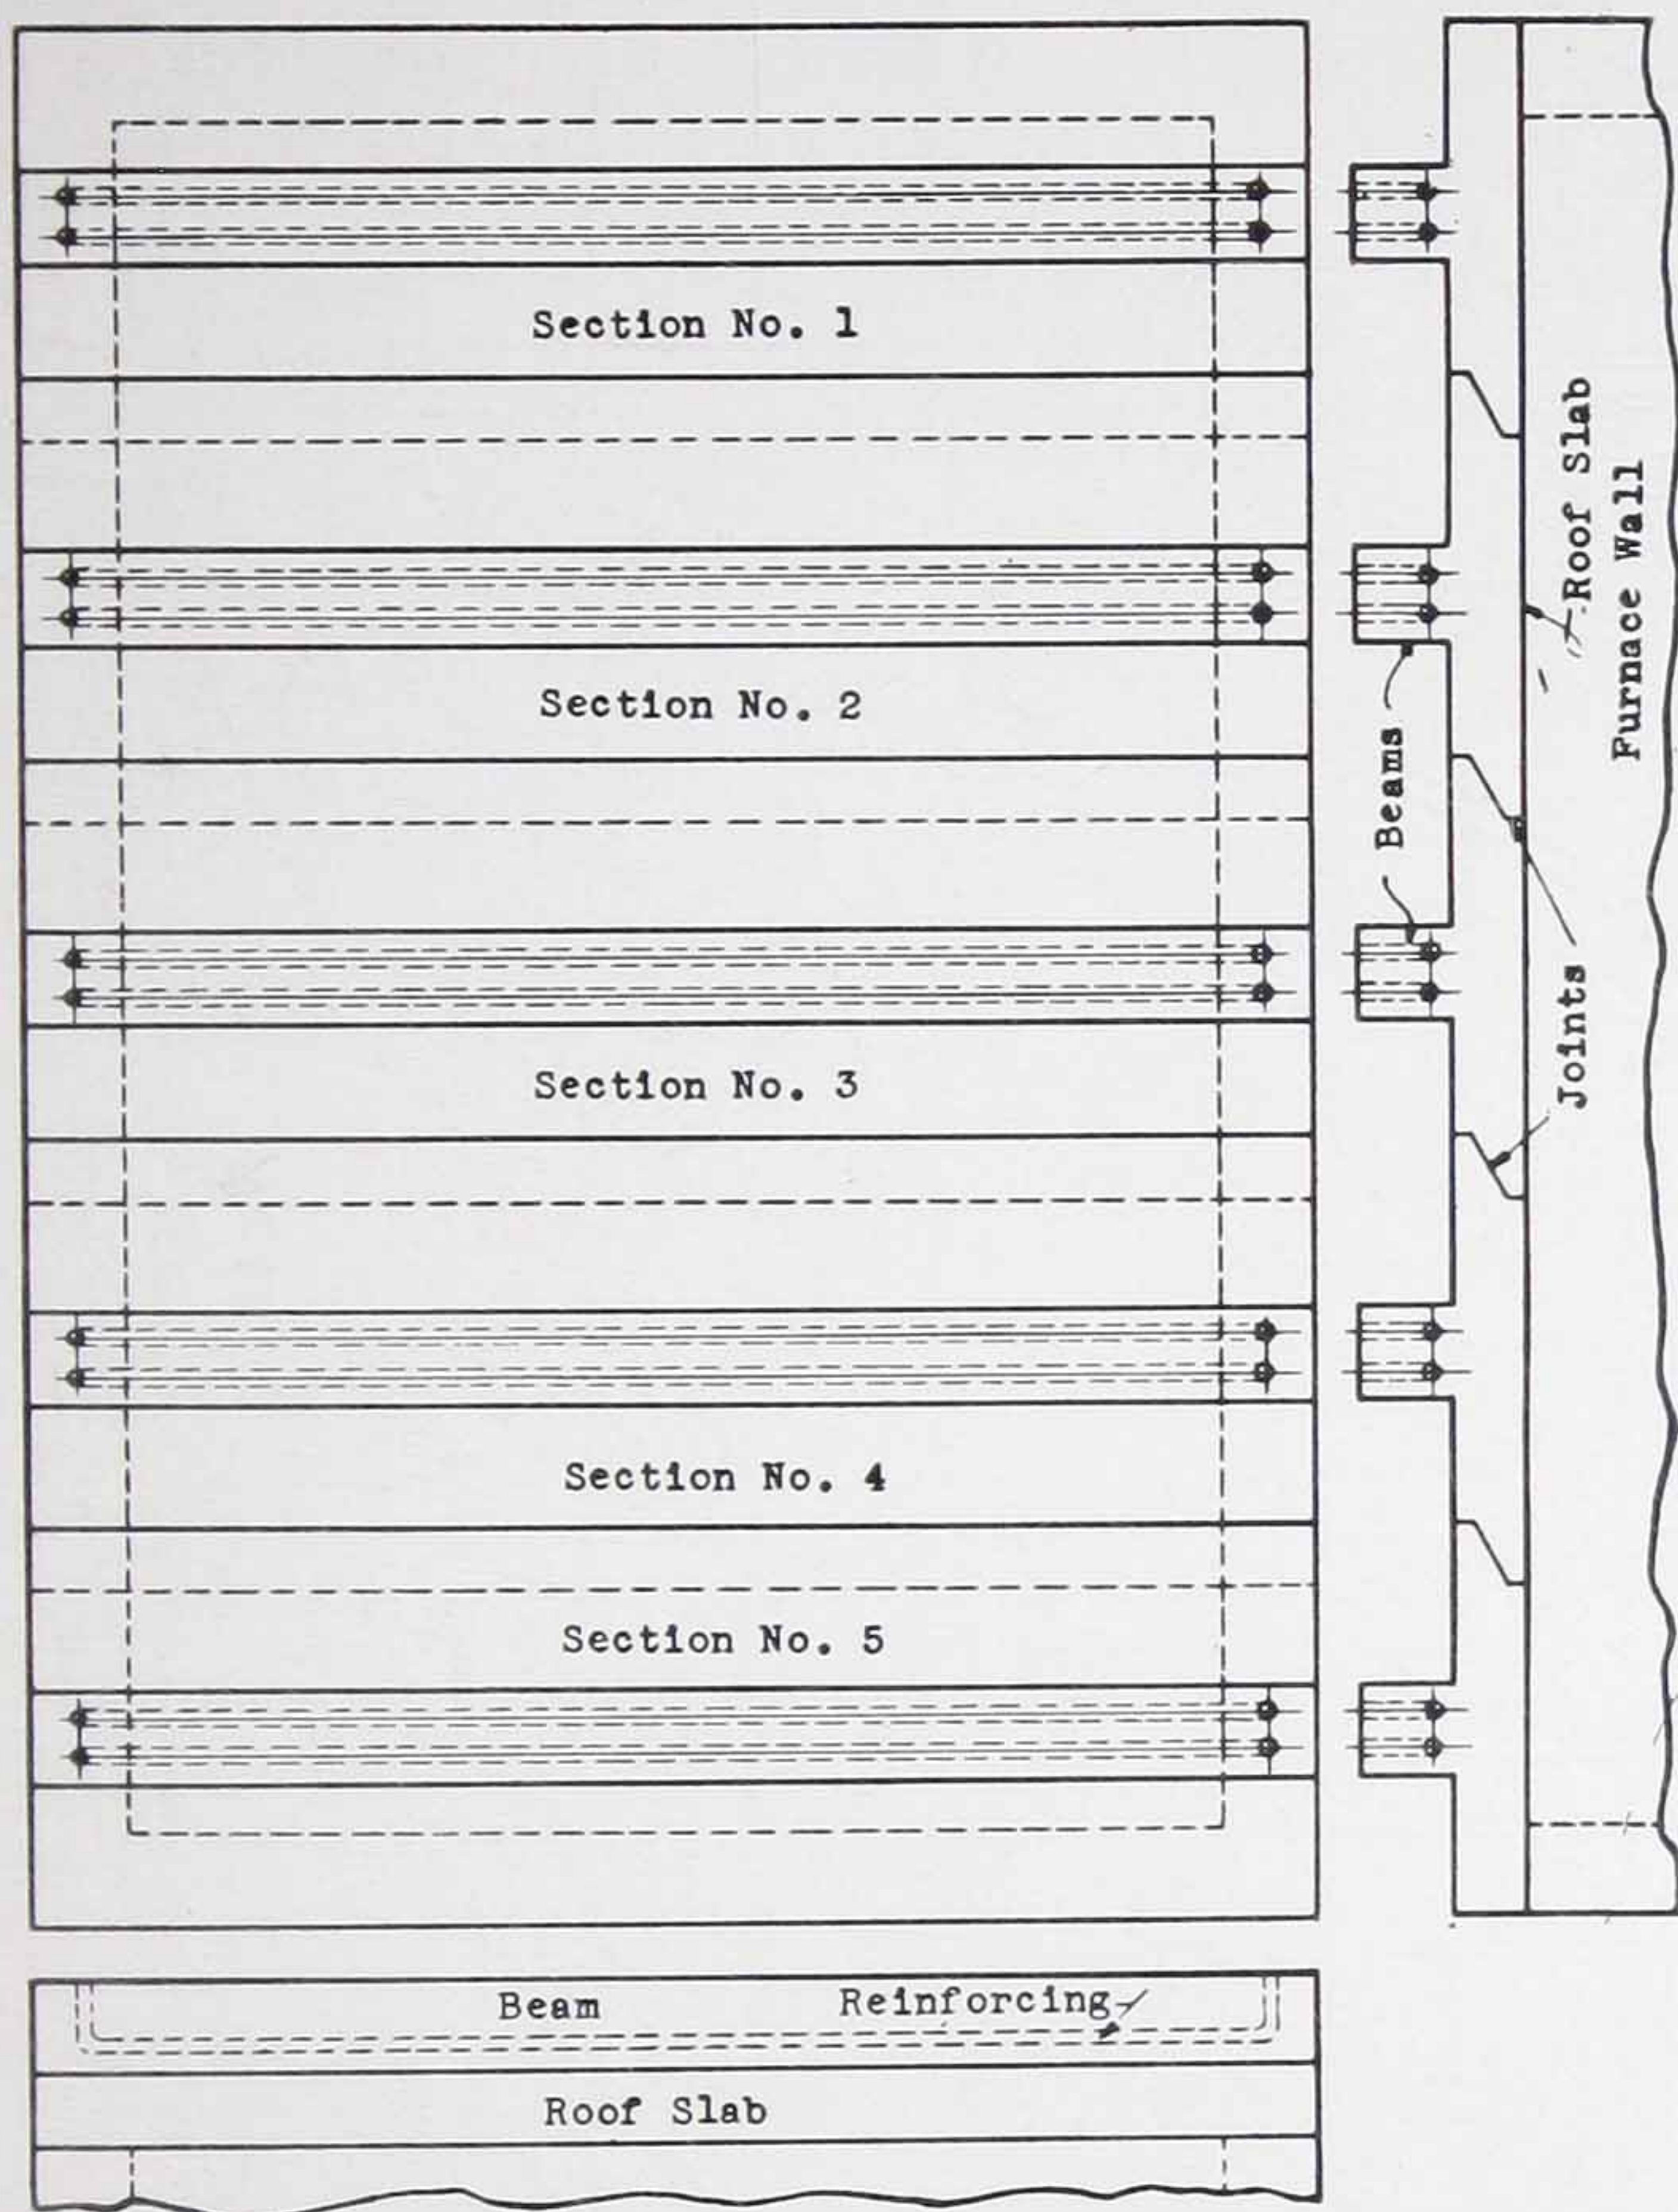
Refractory concrete flat arch for precast or cast in place sections. Procedure for cast-in-place: Pour sections 1, 3 and 5; remove forms "A" (See Fig. 6); paint joint with fire clay slurry; pour sections 2 and 4.
